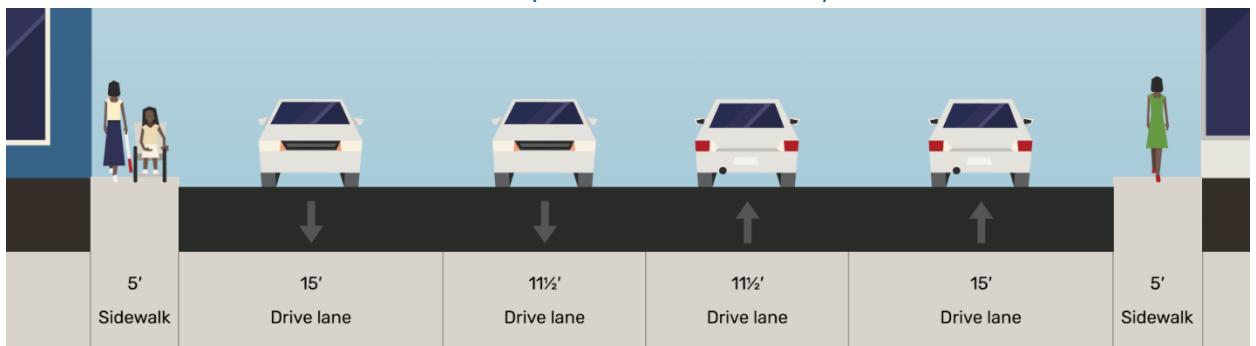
EXISTING TYPICAL SECTION (22ND ST TO 20TH ST)
